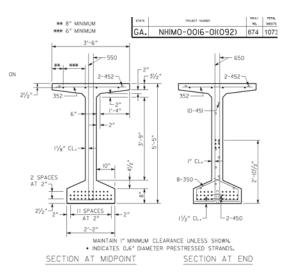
Engineering Drawing. Bulb-Tee section at midpoint and end
